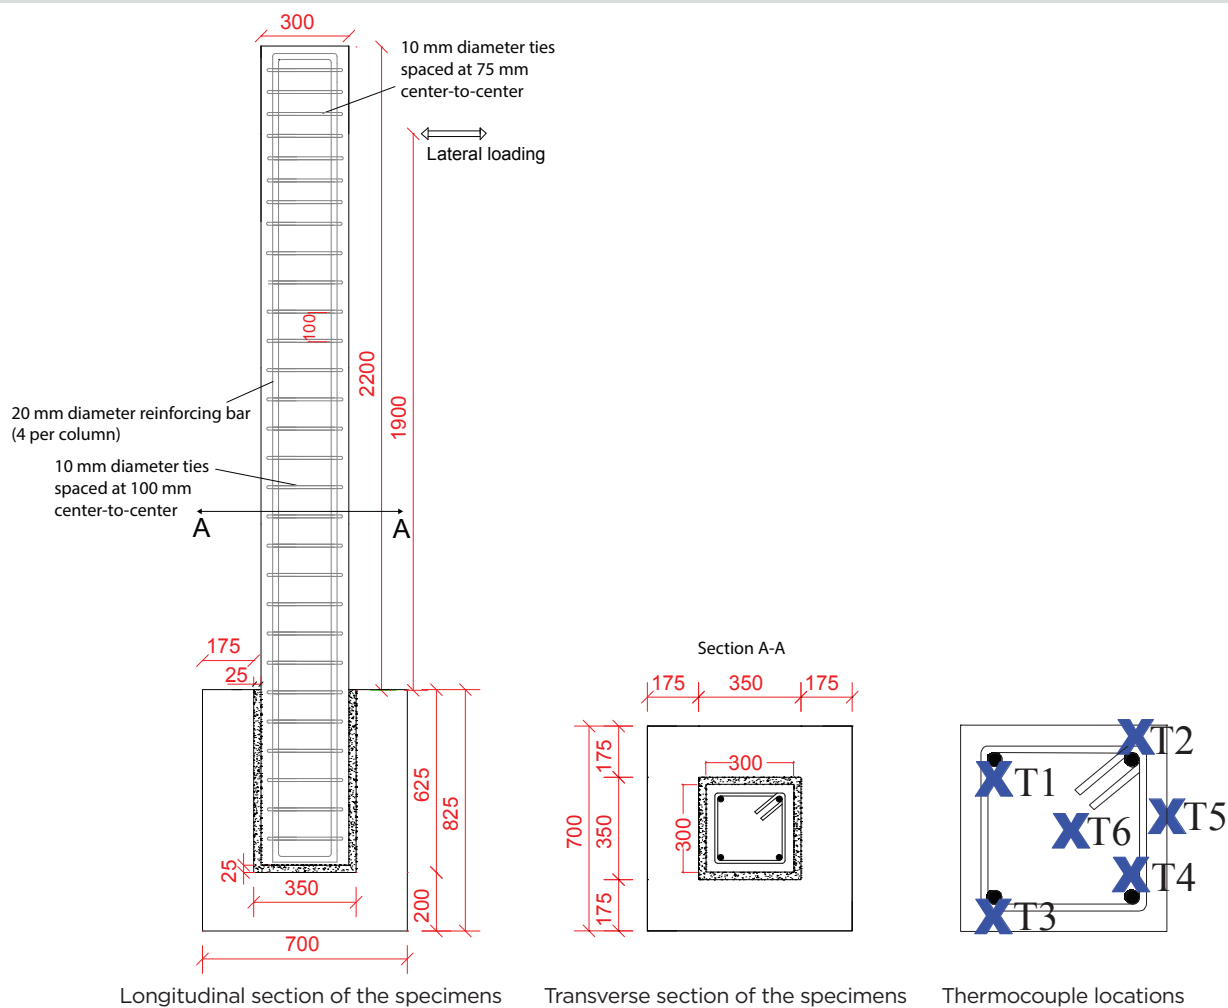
Longitudinal and transverse sections of the specimens and thermocouple locations. Note: All dimensions are in millimeters. 1 mm = 0.0394 in.
